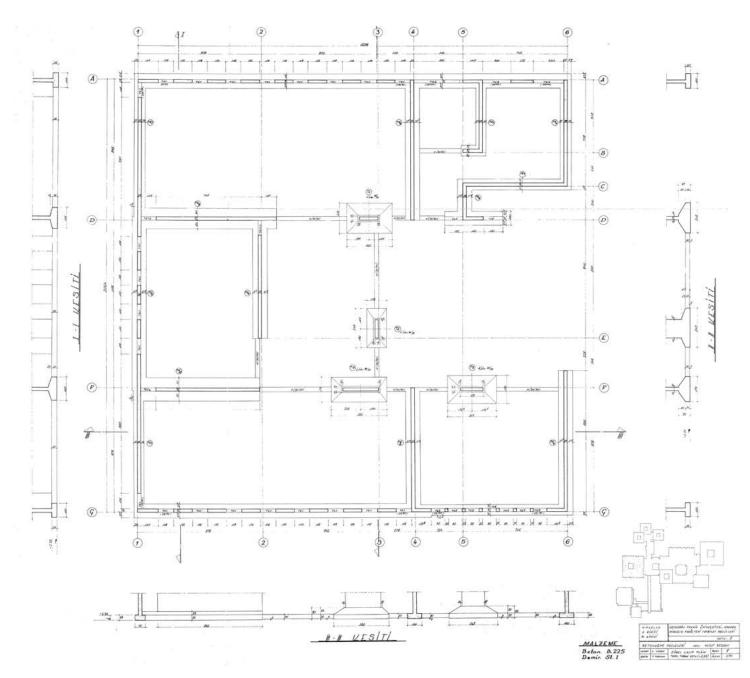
Formwork plan drawing, Application Drawings, 1962.
